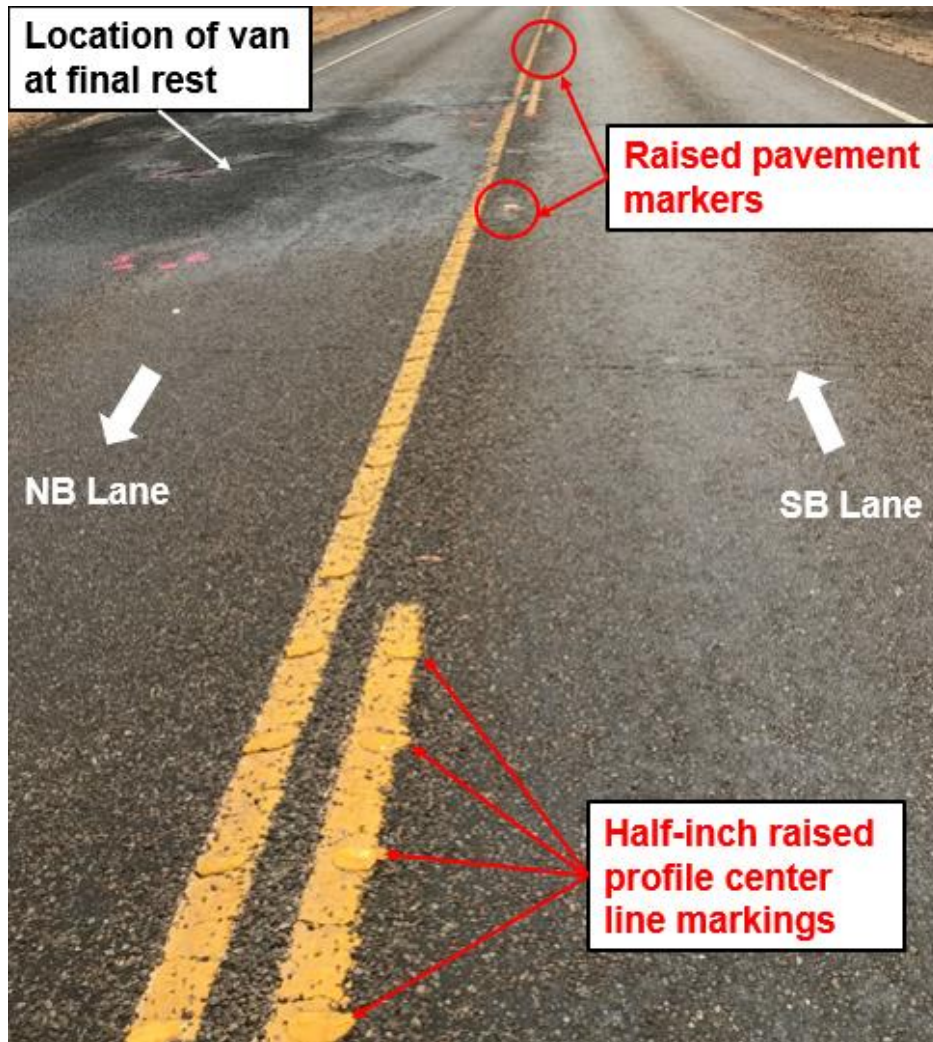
Location of the half-inch raised profile center line markings and raised pavement markers in the vicinity of the crash looking to the south (Source: TxDOT revised).
